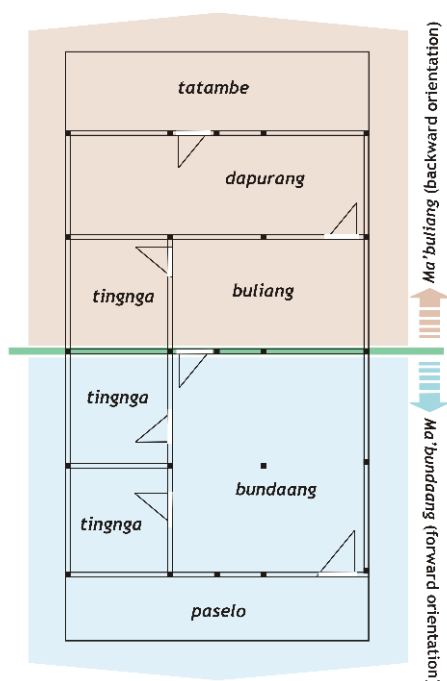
Illustration of the Symmetrical Floor Plan (horizontal) of the Bajo Tribe's Stilt House
